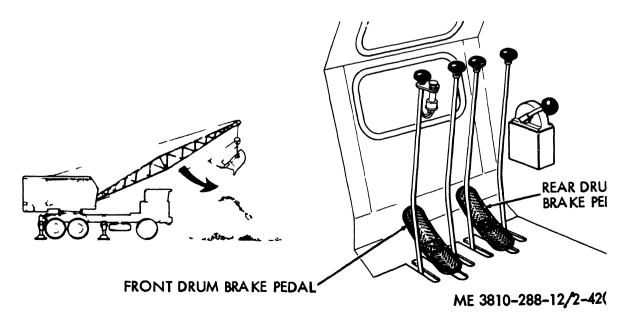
Dragline operation and control positions (sheet 2 of 2)
